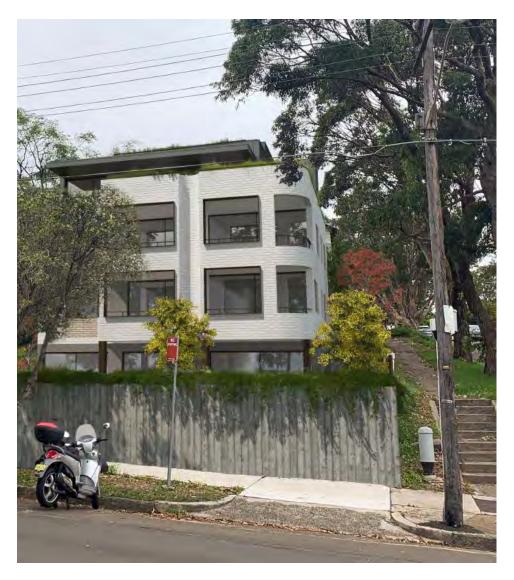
Photomontage of the approved development, as proposed to be modified, as viewed from Old South Head Road, looking east (Source: MHNDU)
